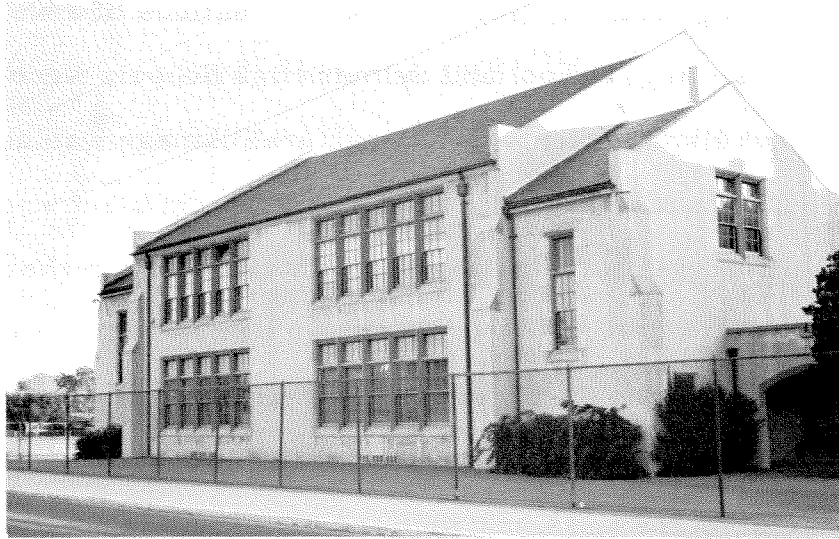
Morningside School at Maclay and Fifth Streets in San Fernando city. This well-constructed 1928 brick wall structure was severely cracked. It had brick corridor walls and crosswalls, concrete corridor slabs, and wood roof and floors. The gable walls had been anchored to the roof framing in recent years.
